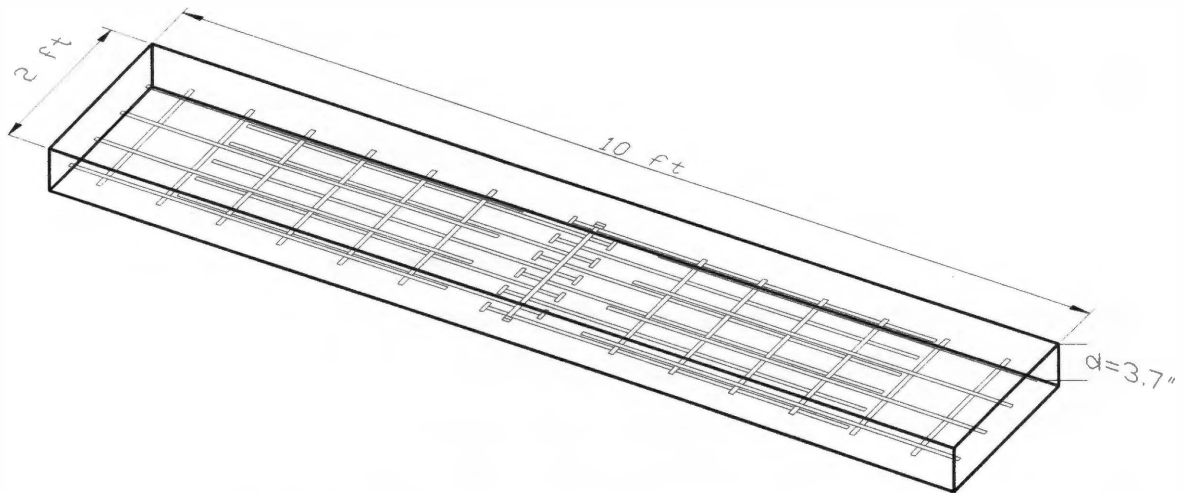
Model Specimen with Headed Bar Reinforcement
